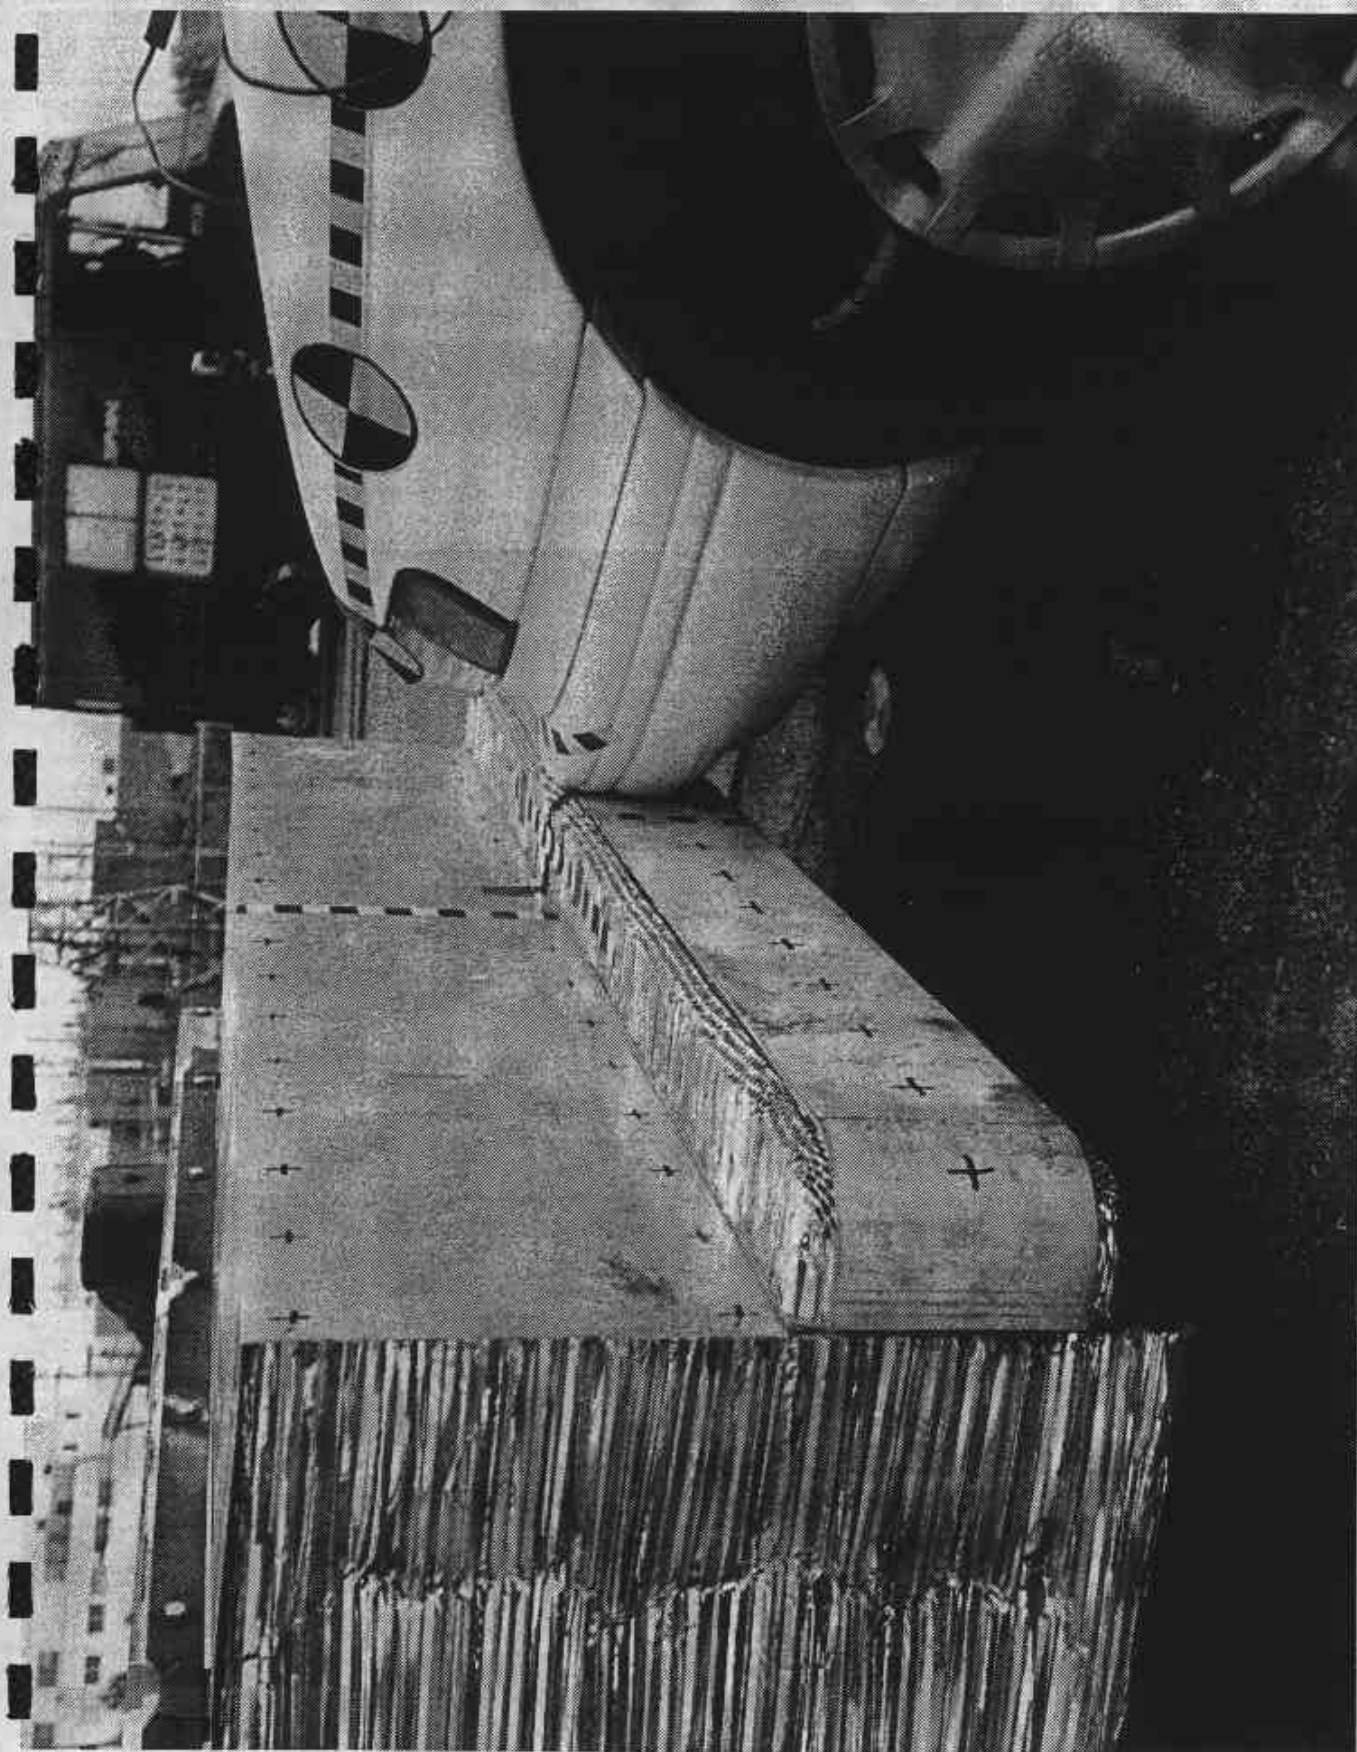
PRE-TEST LEFT SIDE CLOSEUP VIEW OF IMPACT POINT
